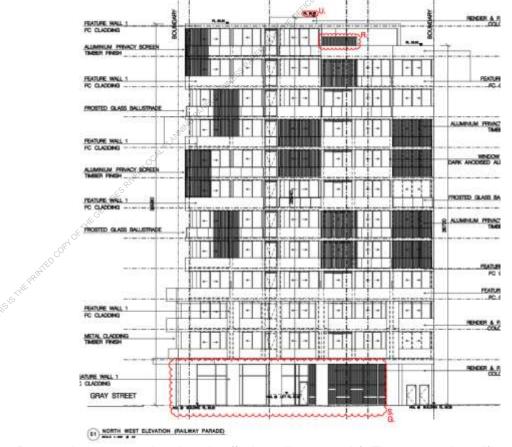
Proposed north-west elevation plan (facing railway parade). The proposed modifications are clouded in red.
